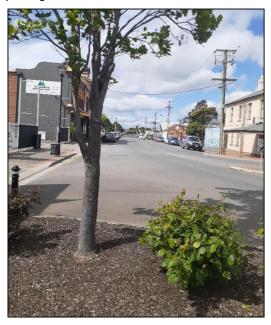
shows the traffic signage from Wellington Street south turning right into Wellington Street north as a Give Way control. This option will require a similar raised traffic island and signage to restrict right turns. The new raised island would extend to the left of existing island shown to prohibit right tun movements.
